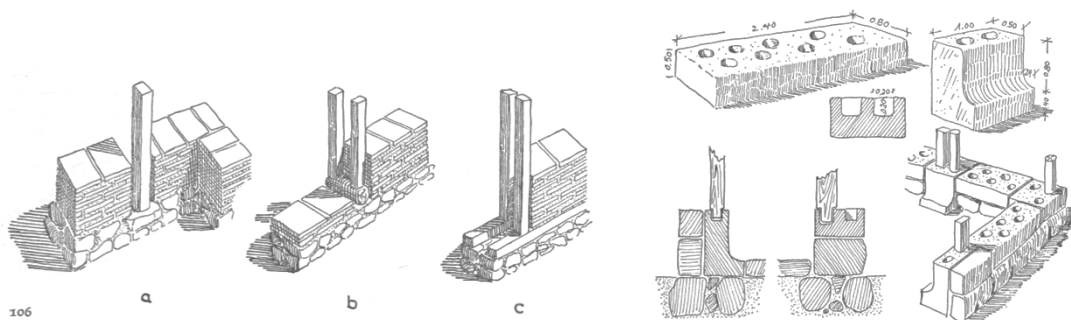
Kültepe/Kanesh, mudbrick masonry walls with vertical timber supports, also on the sides of the door and window openings from the Assyrian colony (Karum) period (a; left) [15]; and Alacahöyük, stone sockets for vertical timber supports in mudbrick masonry (b; right) [16].
